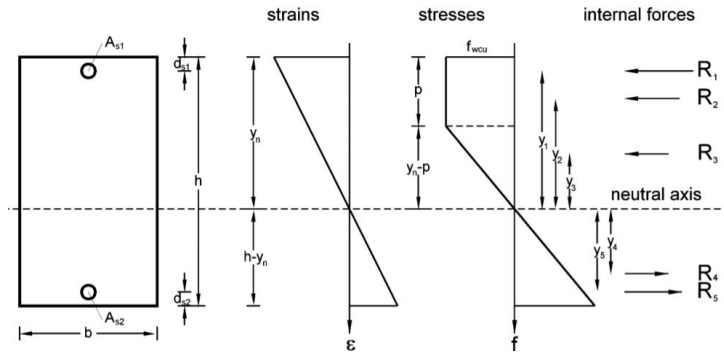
Internal forces of a timber beam with steel bars within the top and bottom
